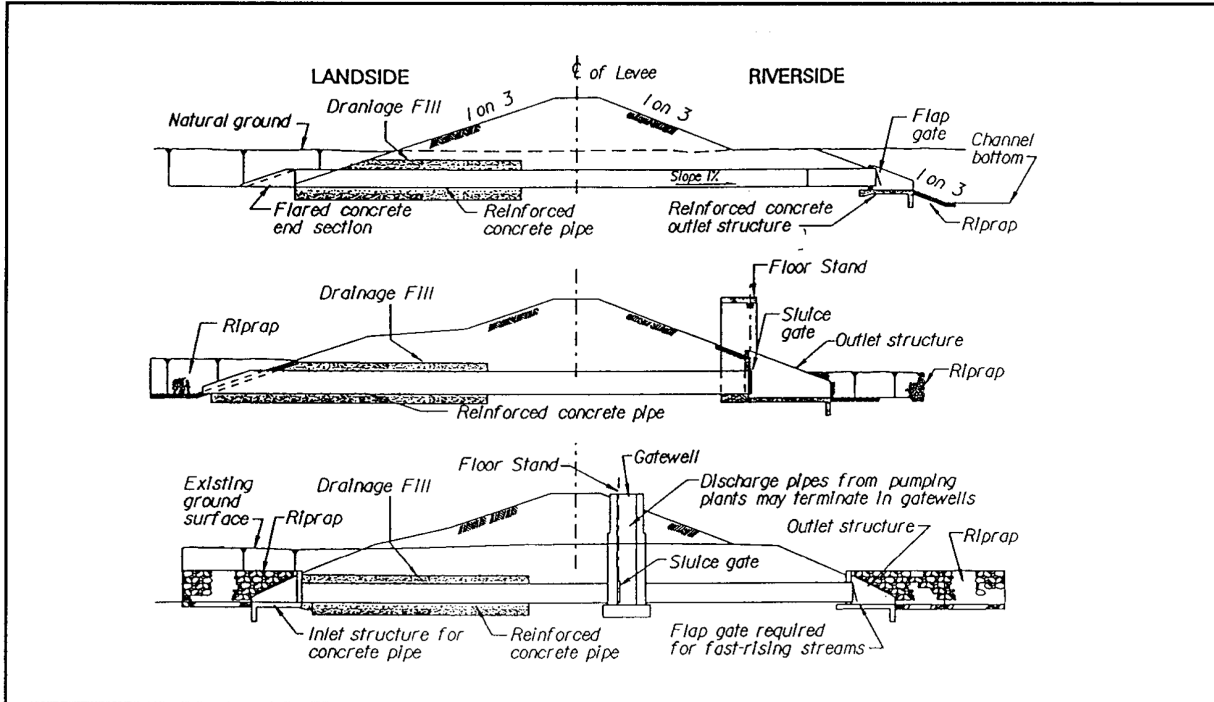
Examples of Typical Sections of Drainage Structures through Dikes (floodboxes), as originally provided in Figure 8-1 from USACE (2000)
